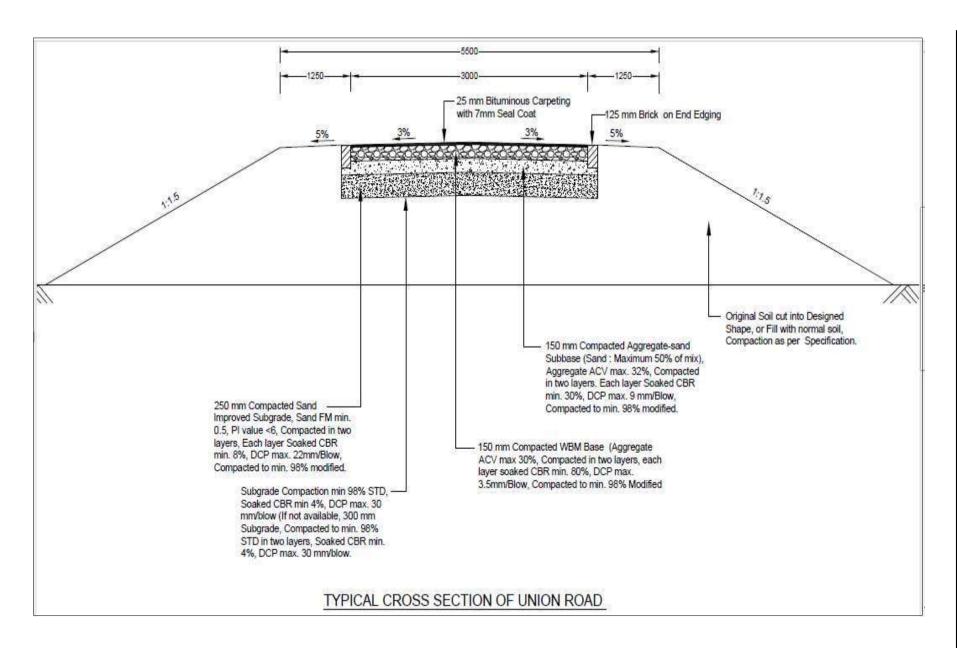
Typical Cross Section of Union Road (LGED, 2005)
